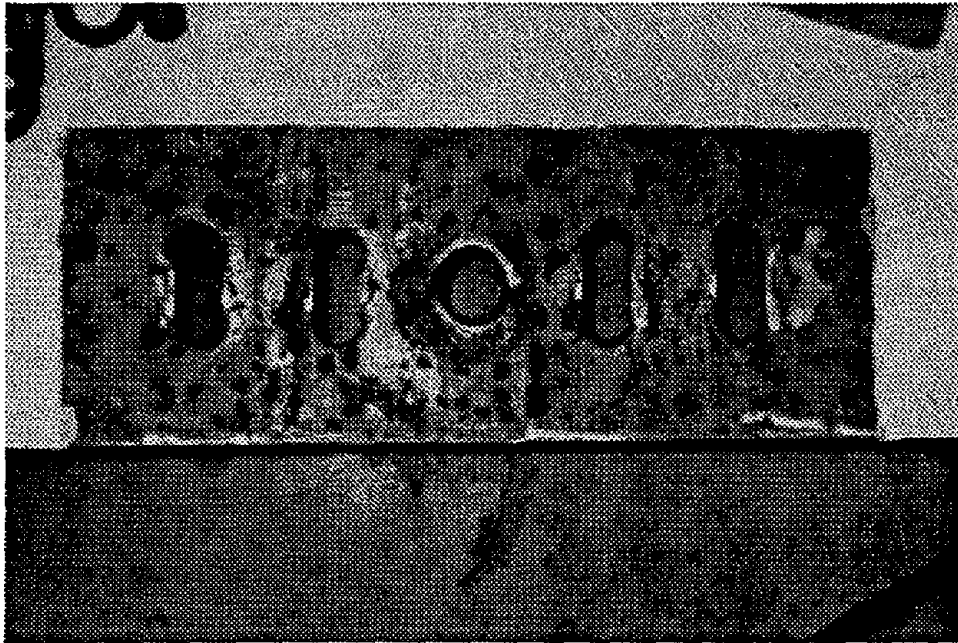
Beam web under the shear plate of Specimen 7A shows no damage after the test. The center pivot bolt hole was enlarged by load reversals.
